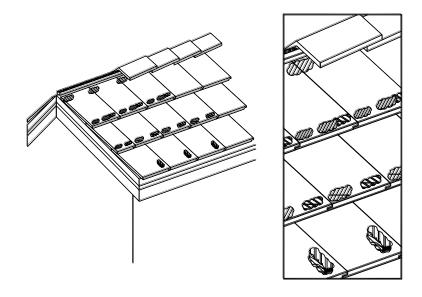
Placement Detail "A" Flat/Low Profile Roofing Tile
